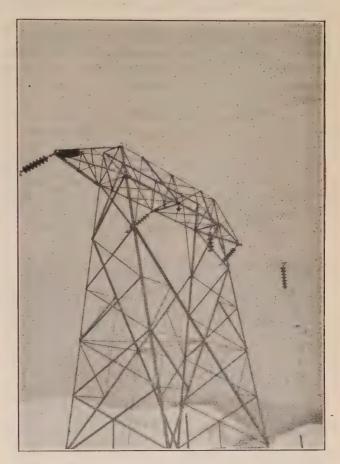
Line Damage, Summit Angle, Tower No. S25, Looking North
